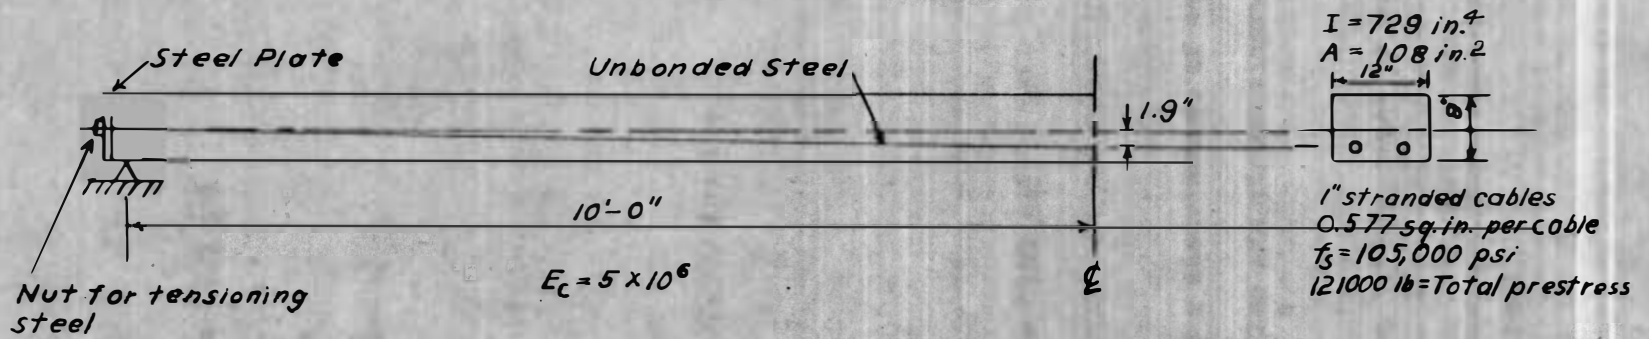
STRESSES IN AN UNBONDED PRESTRESSED CONCRETE BEAM
